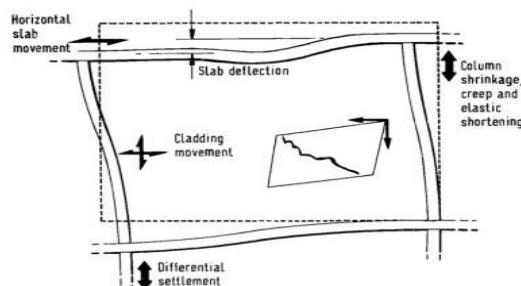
Failure of wall panel due to differential axial shortening (Fintel et al. 1987)
